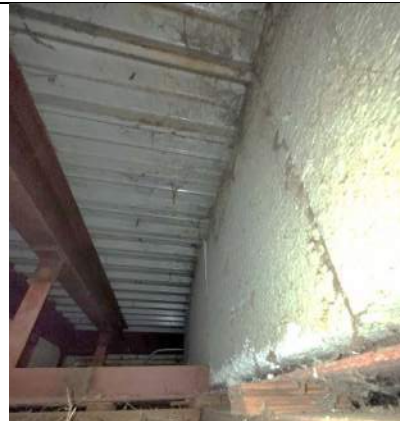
View of the exterior wall assembly from within the first-floor soffit. Note the spider webs and atmospheric staining between the metal roof deck and the infill extruded polystyrene (EPS) insulation.
